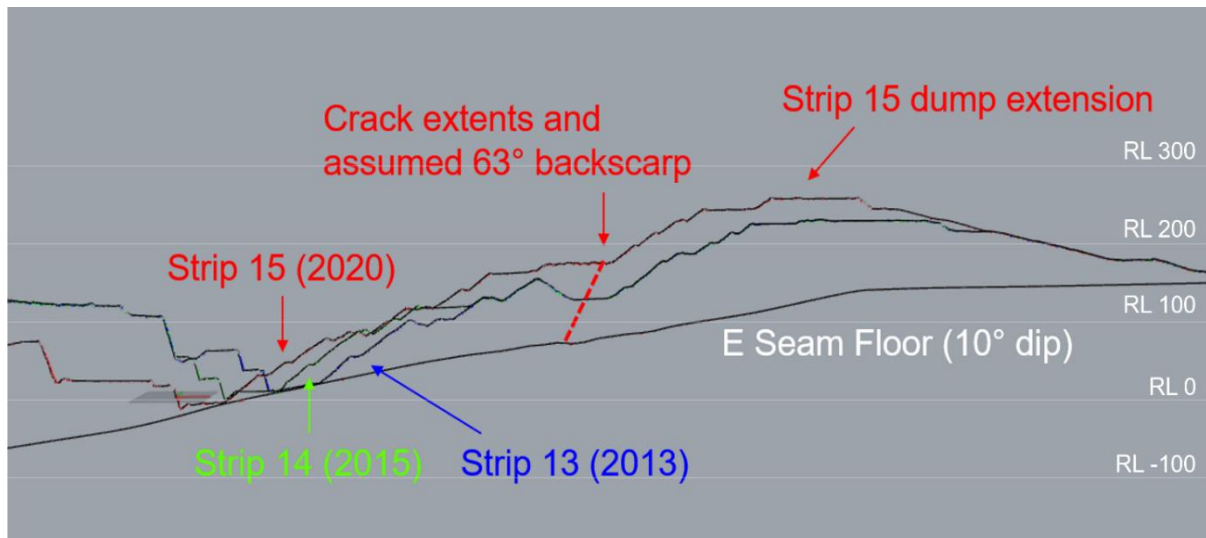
Configuration of Pit 6-8 strip 13-15 lowwall showing significant volume of additional spoil emplacement in strip 15 truck dump extension
